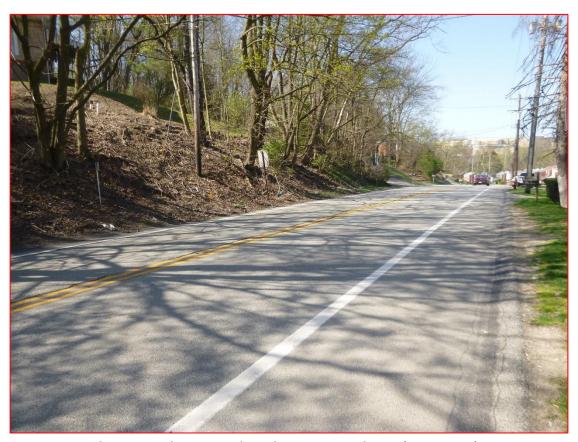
Jacks Run Road South – Facing Southwest (04.12.2023)
